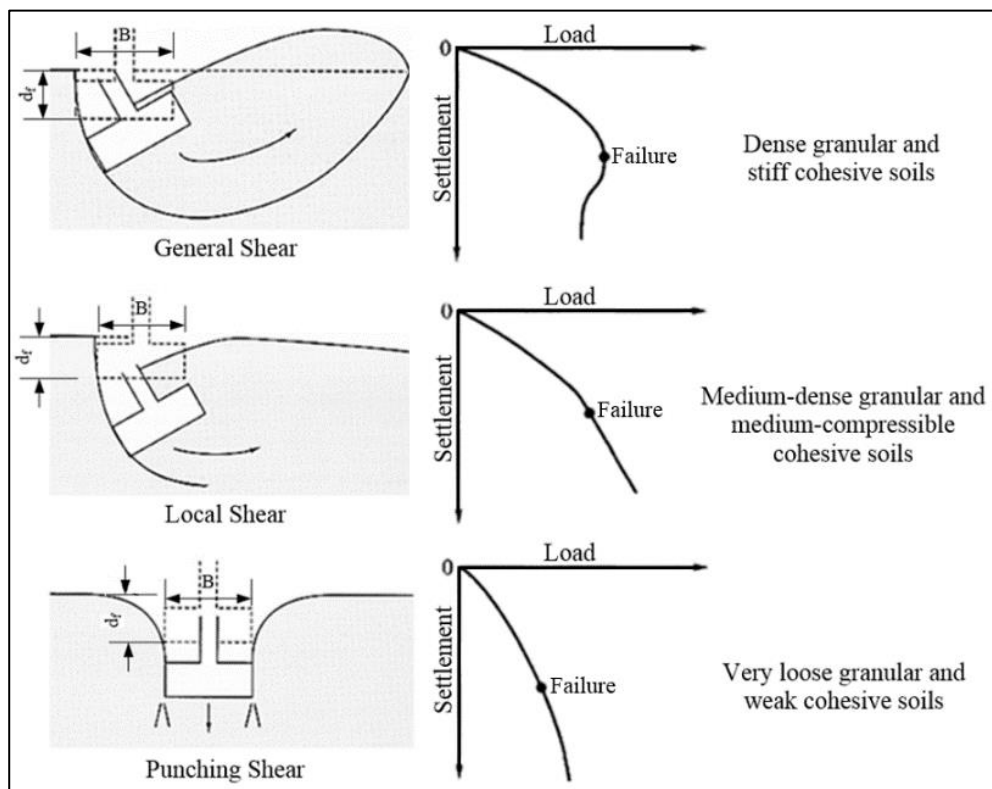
Failure Modes of a Shallow Foundation
